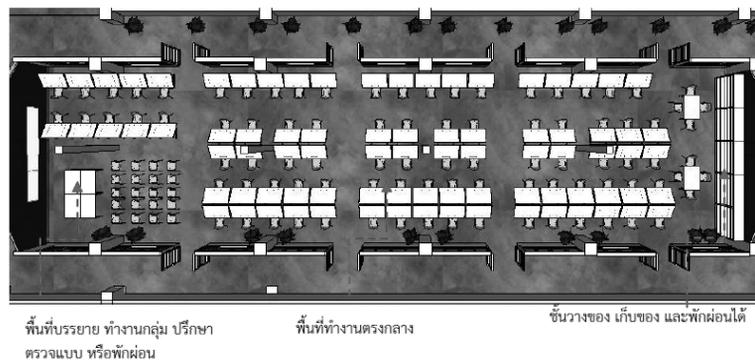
Furniture lay out AR-508 (Floor 5) studio type 2
